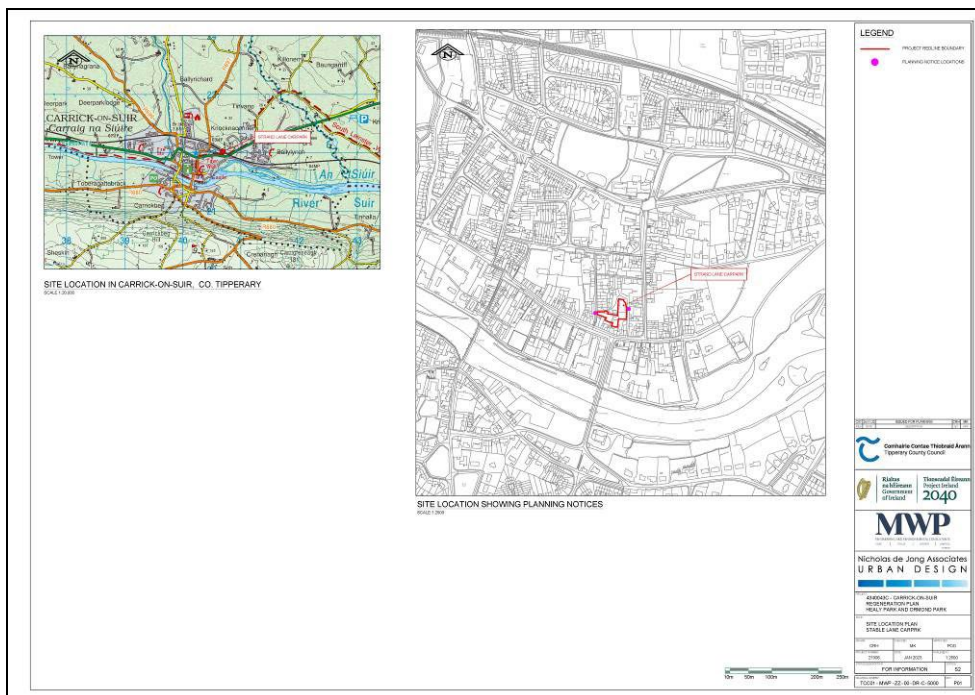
Location of the proposed new car park at Stable Lane/Chapel, north off Main Street, Carrick-on-Suir.
